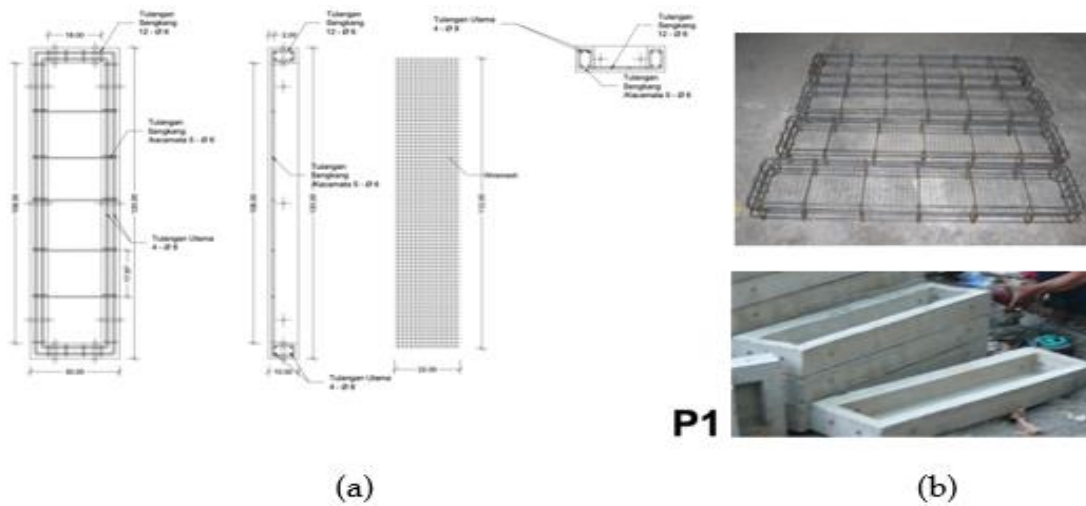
Component and Reinforcement Details for P1, Consists of its Rebar Detailing (A) and Real-Life Example (B)
